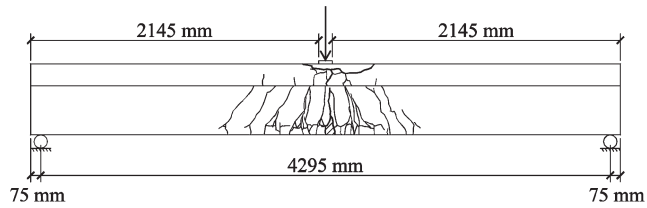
Test setup and crack patterns for multiple-strand development length specimen HPC-1 (north face).
